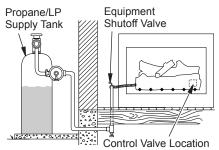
Checking Gas Joints (Propane/LP Model Shown)
